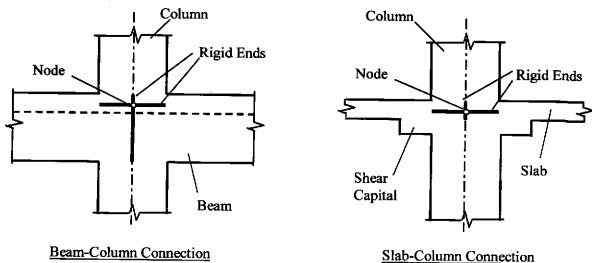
Rigid End Zones for DRAIN-2DM Model [Adapted from Hueste and Wight (1997)]
